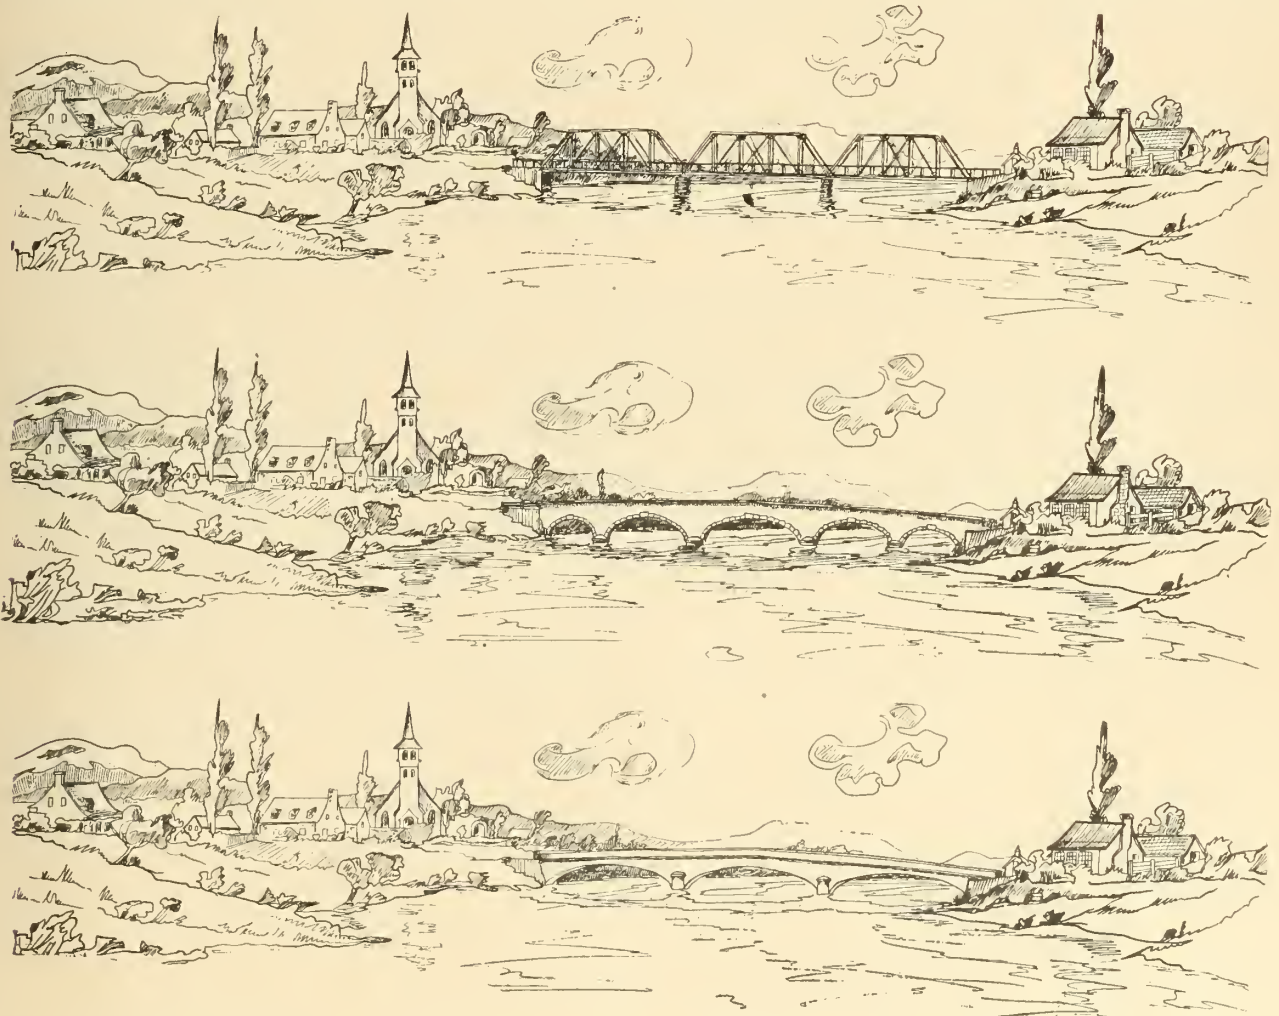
Concrete Bridge Designs compared with ordinary Steel Truss Bridge.
